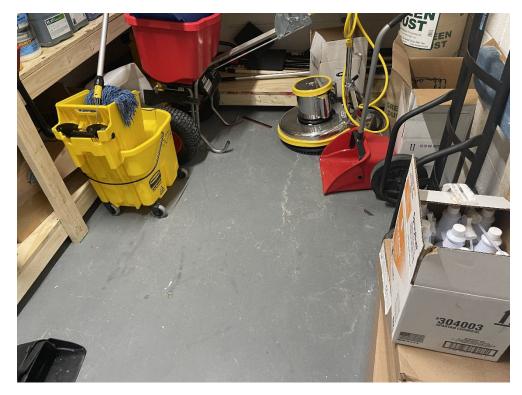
Photo of the concrete slab in a storage room in the Site's cellar.
